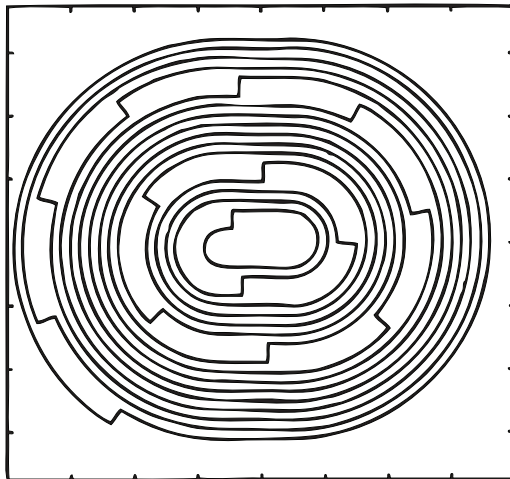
Pit with 45 degree inter-ramp slope and a road system (Source: Atkinson, SME, 1983)
